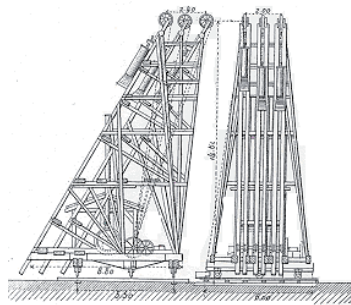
The Sonnette triple pile driving system used in Bremen, 1850 [Rochemont and Desprez 1900]
